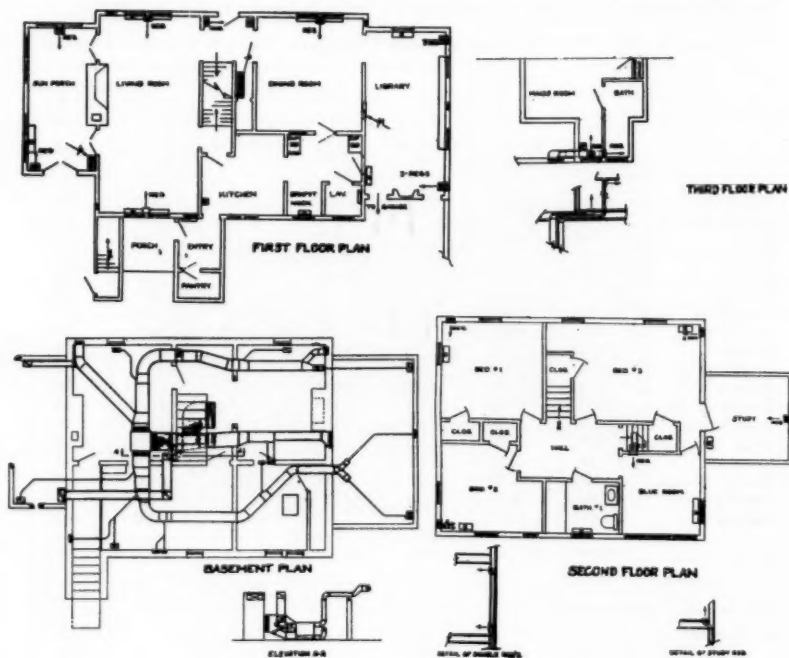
FLOOR PLAN AND DUCT LAYOUT
